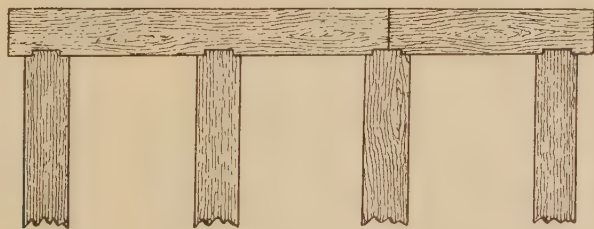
Method of making joint in two-piece cap in long inclined shaft.
